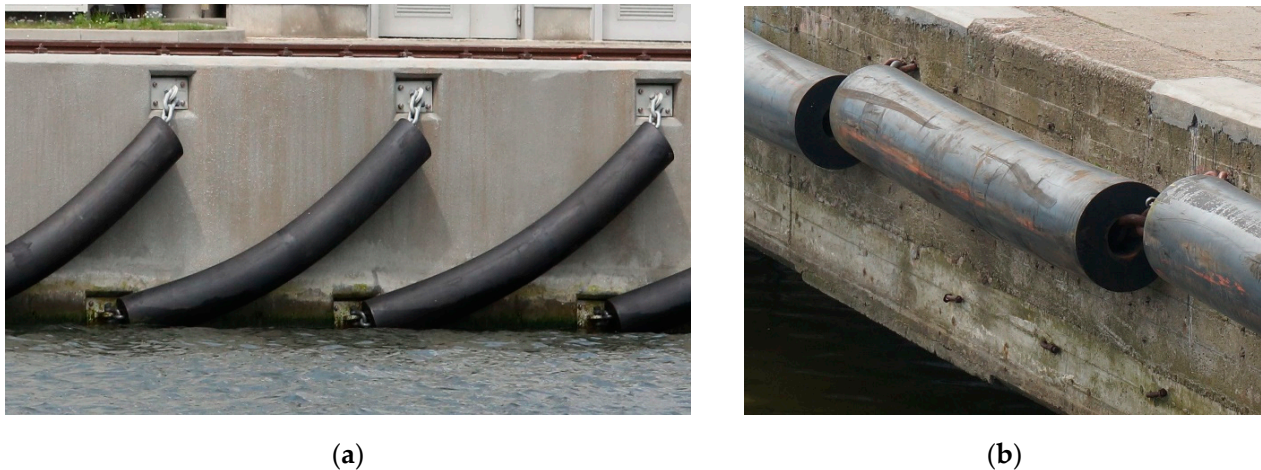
Cylindrical fenders and examples of their mounting on the quay. (a) Cylindrical oblique fenders; (b) Horizontally mounted cylindrical fenders.
